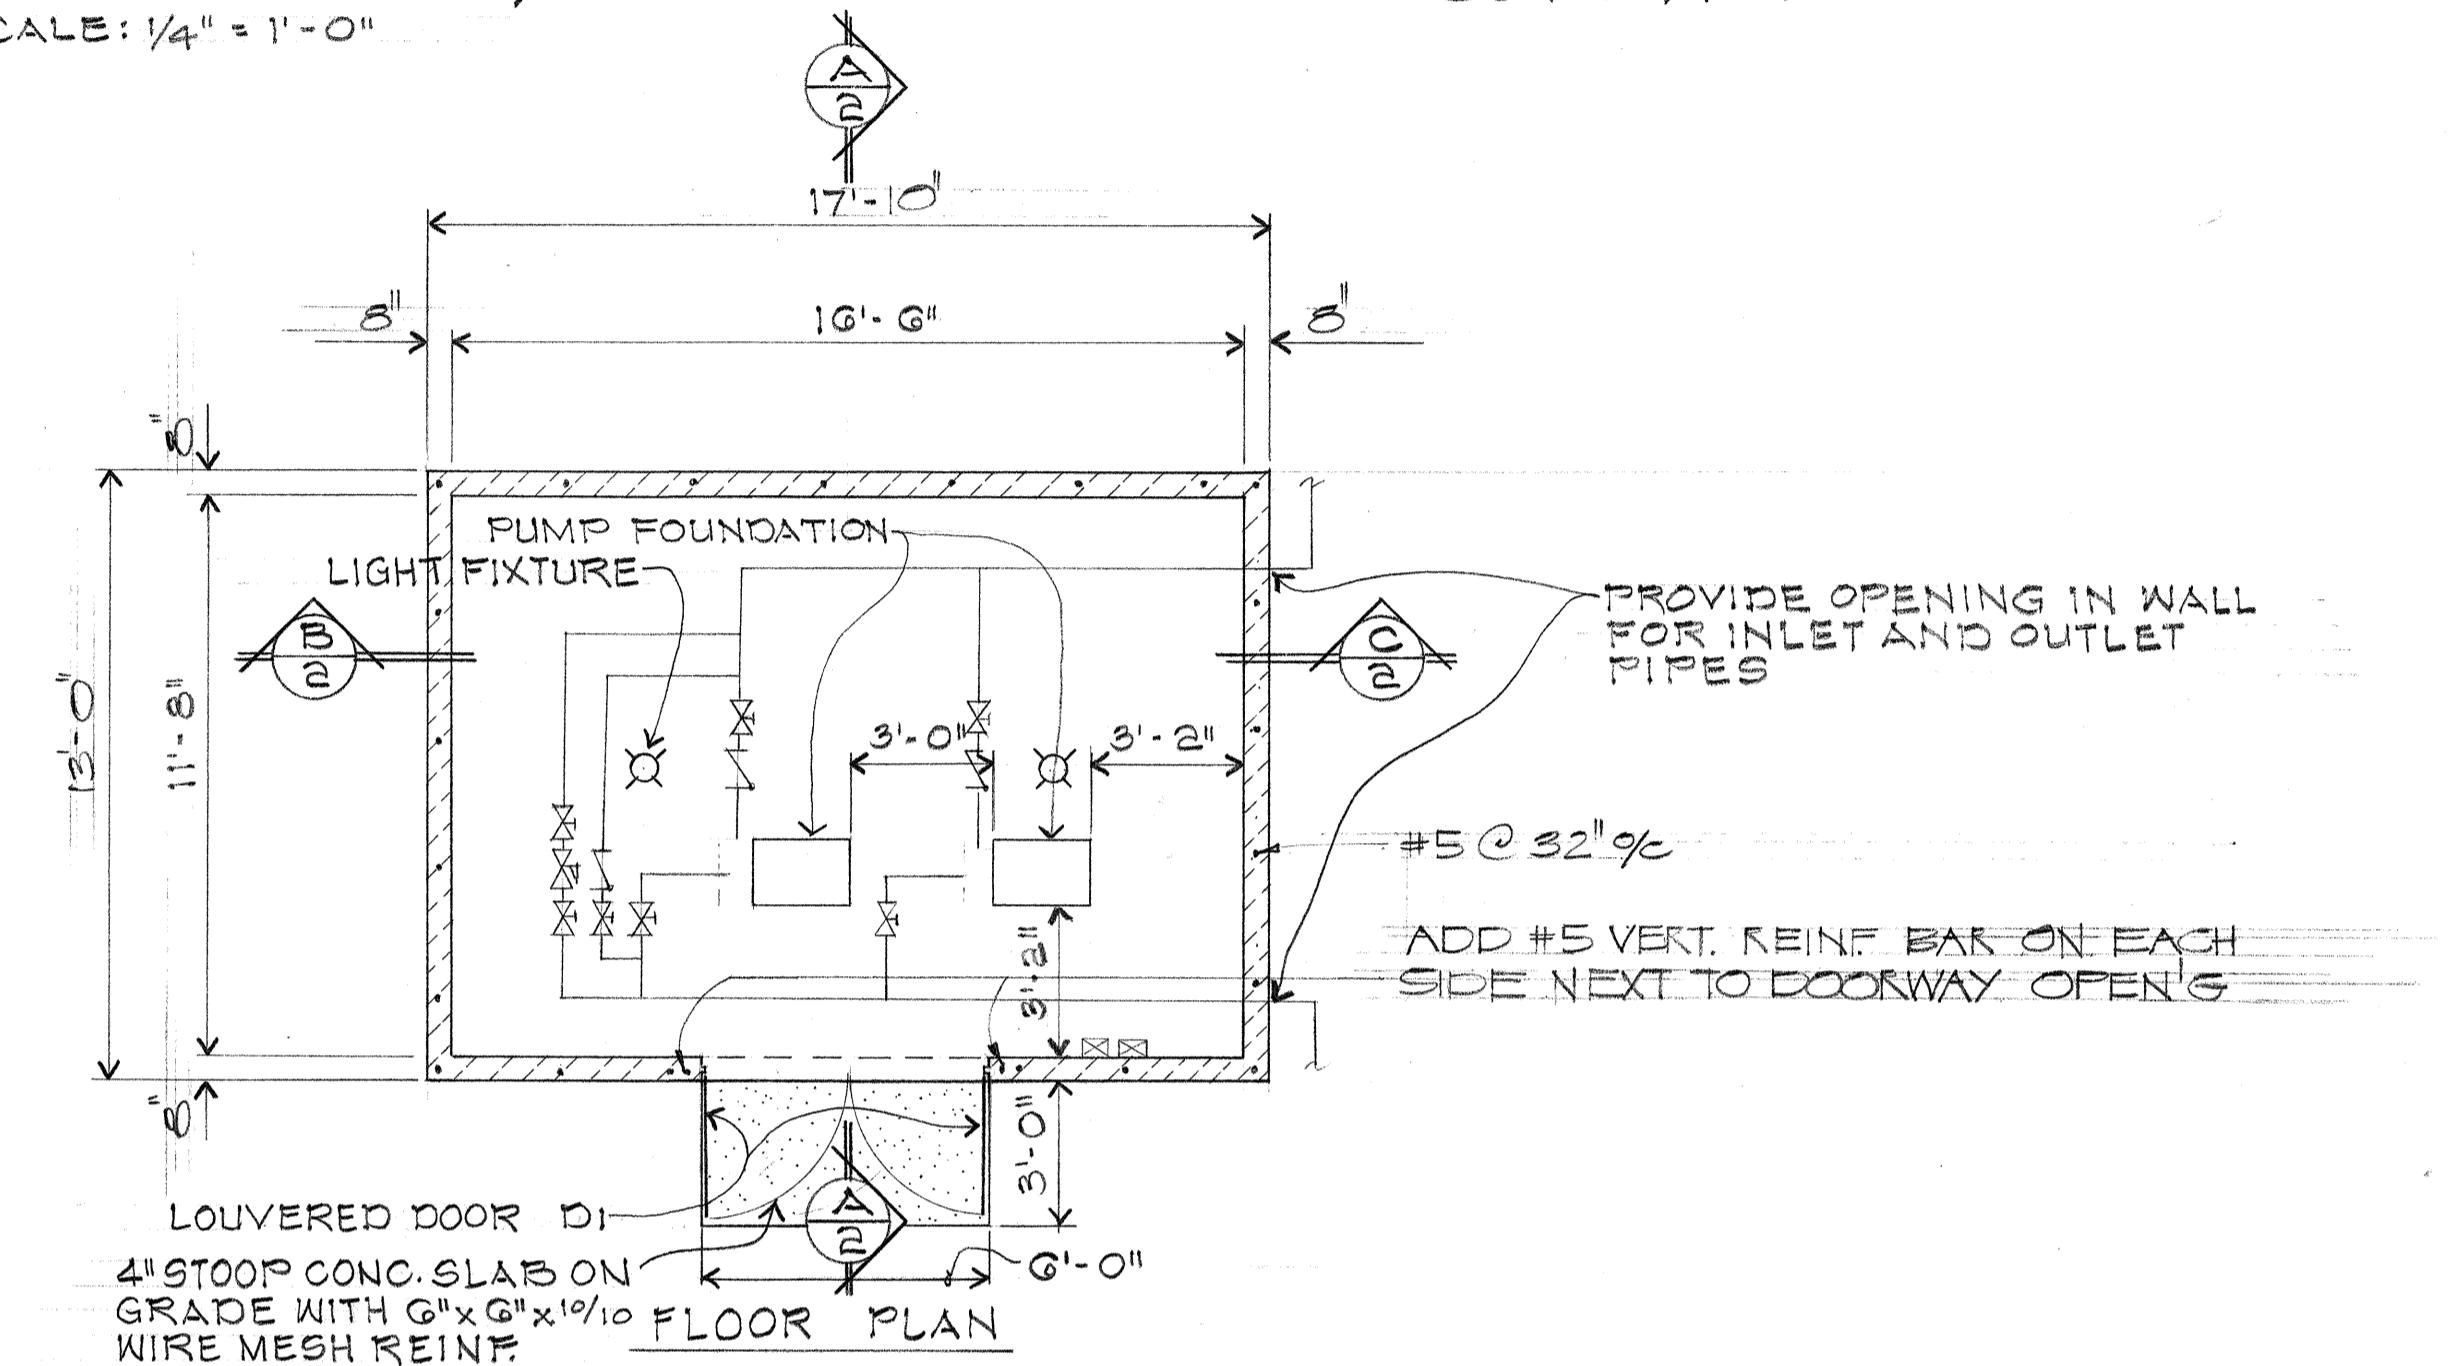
/25 PUMP HOUSE FOR ONE PUMP
